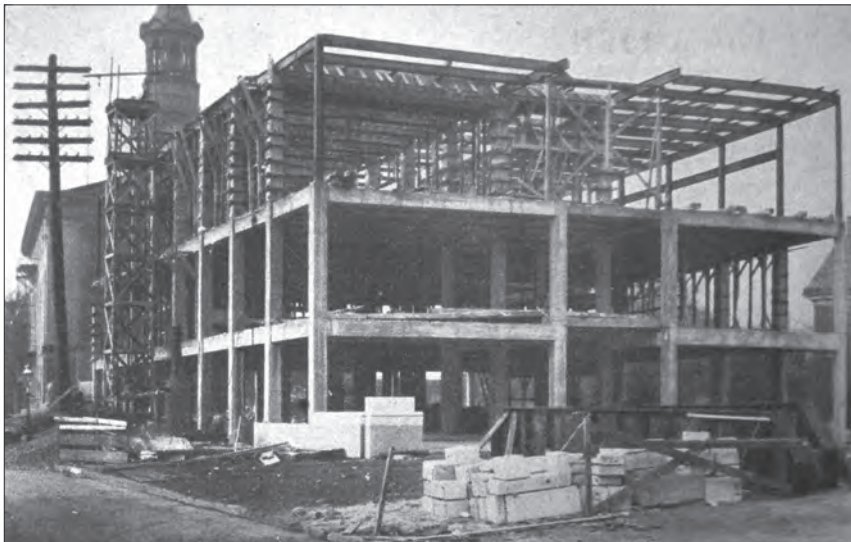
1923, Construction image of Germantown Town Hall's office block, showing the concrete encased steel structure, Source: "Address Delivered at the Laying of the Corner Stone of the New Town Hall in Germantown December 18th, 1923," *The Beehive*, January 1924, Vol. 5, No.4; 1.
